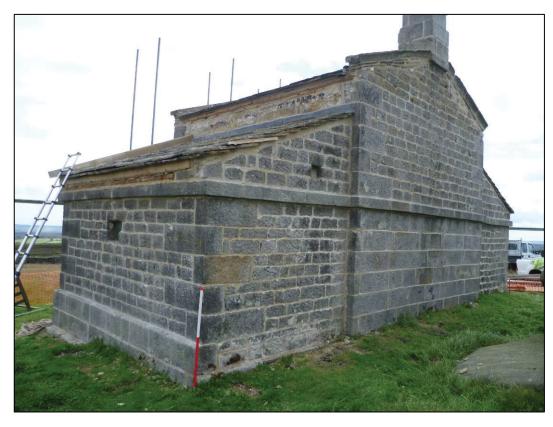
Rocking Hall under repair, looking S (photo 3/101).
